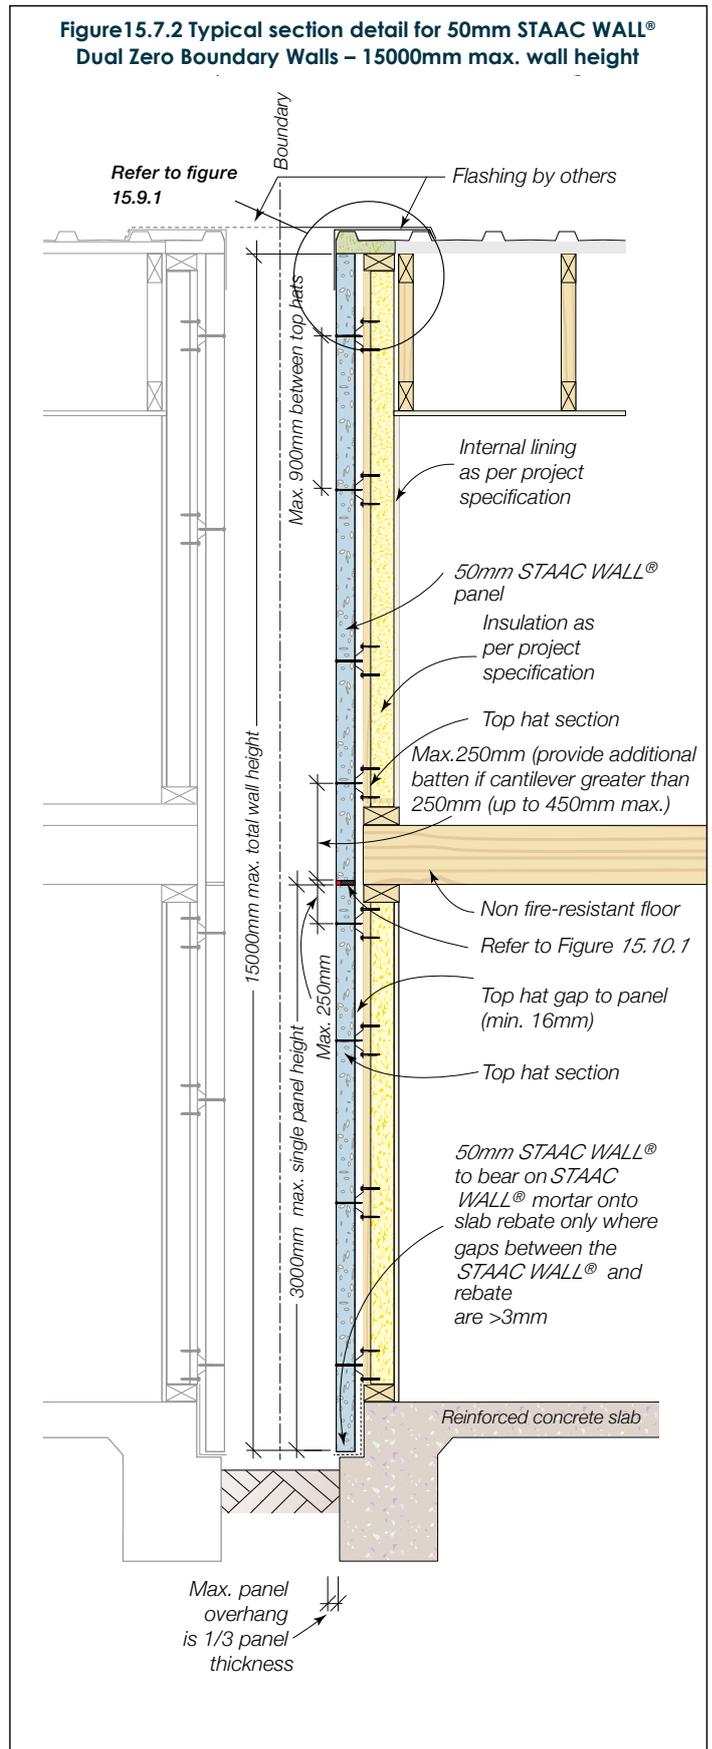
Typical section detail for 50mm STAAC WALL® Dual Zero Boundary Walls – 15000mm max. wall height
